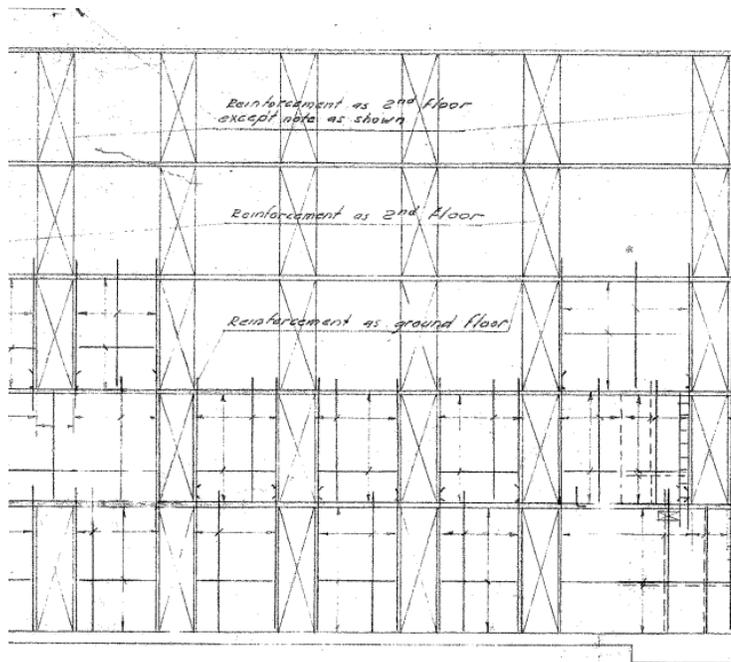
Place Vanier typical wall reinforcement schematic from record drawings
